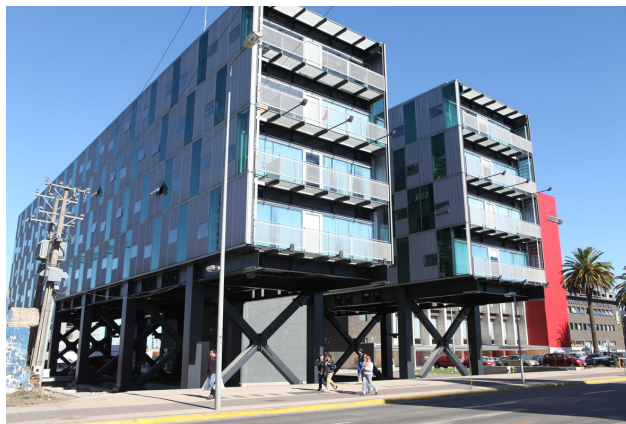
Elevated Office Building in Concepcion, Chile [33]
